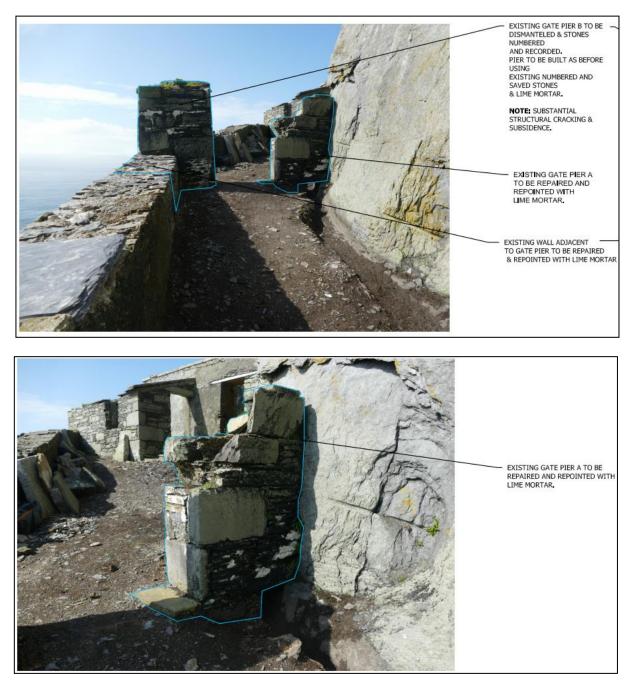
Proposed works to inner and outer gate piers at Upper Lighthouse
